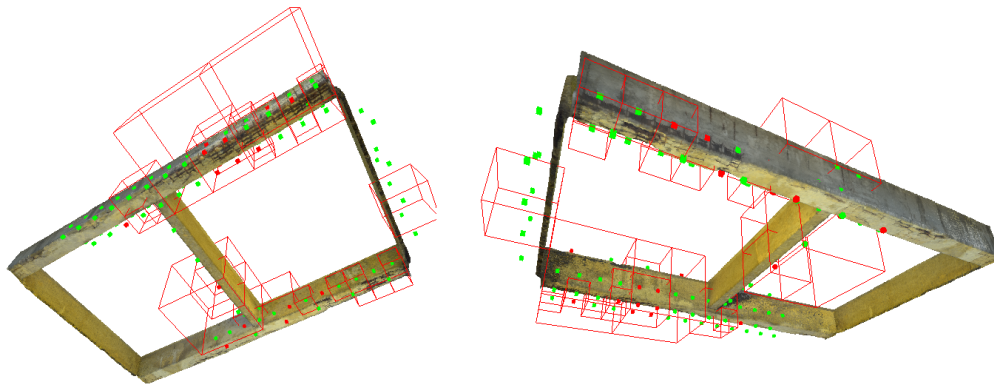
Example spalling damage classification using multiview classification with a girder bridge component. The larger red cubes indicate damage clusters that will be extracted as damage features and used for geometric reconstruction and semantic enrichment of the *as-built* IFC model.
